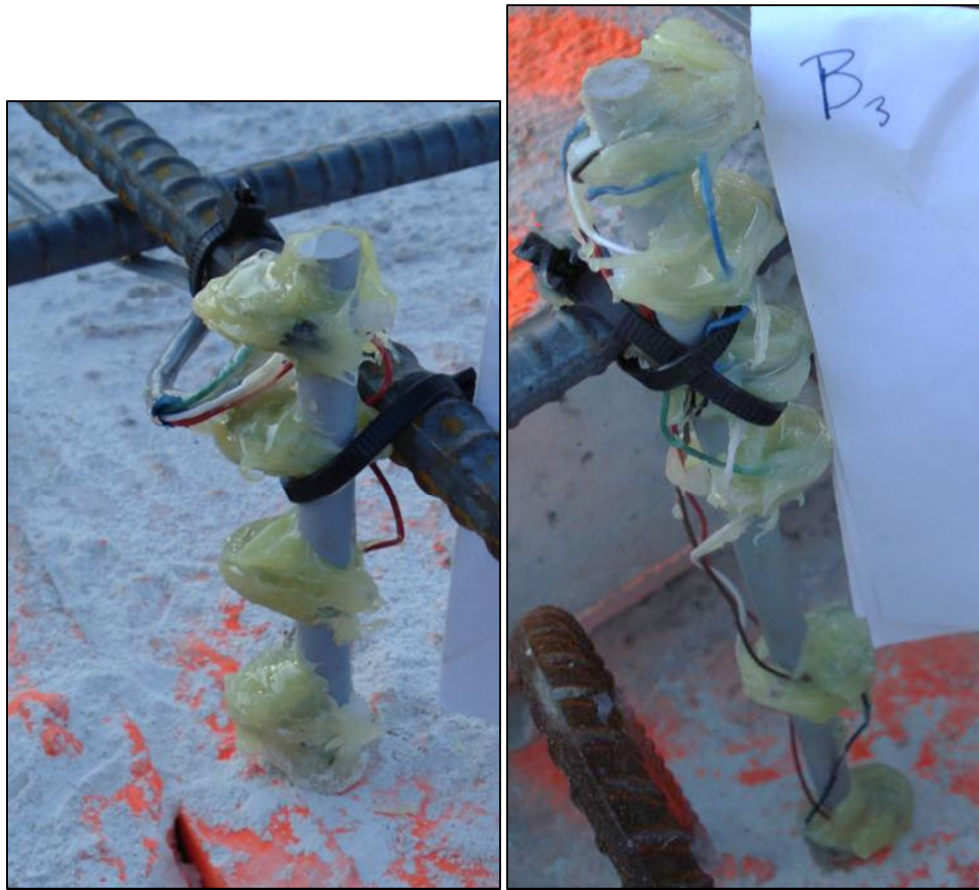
iButton strings for Georgetown bridge deck winter pour.
